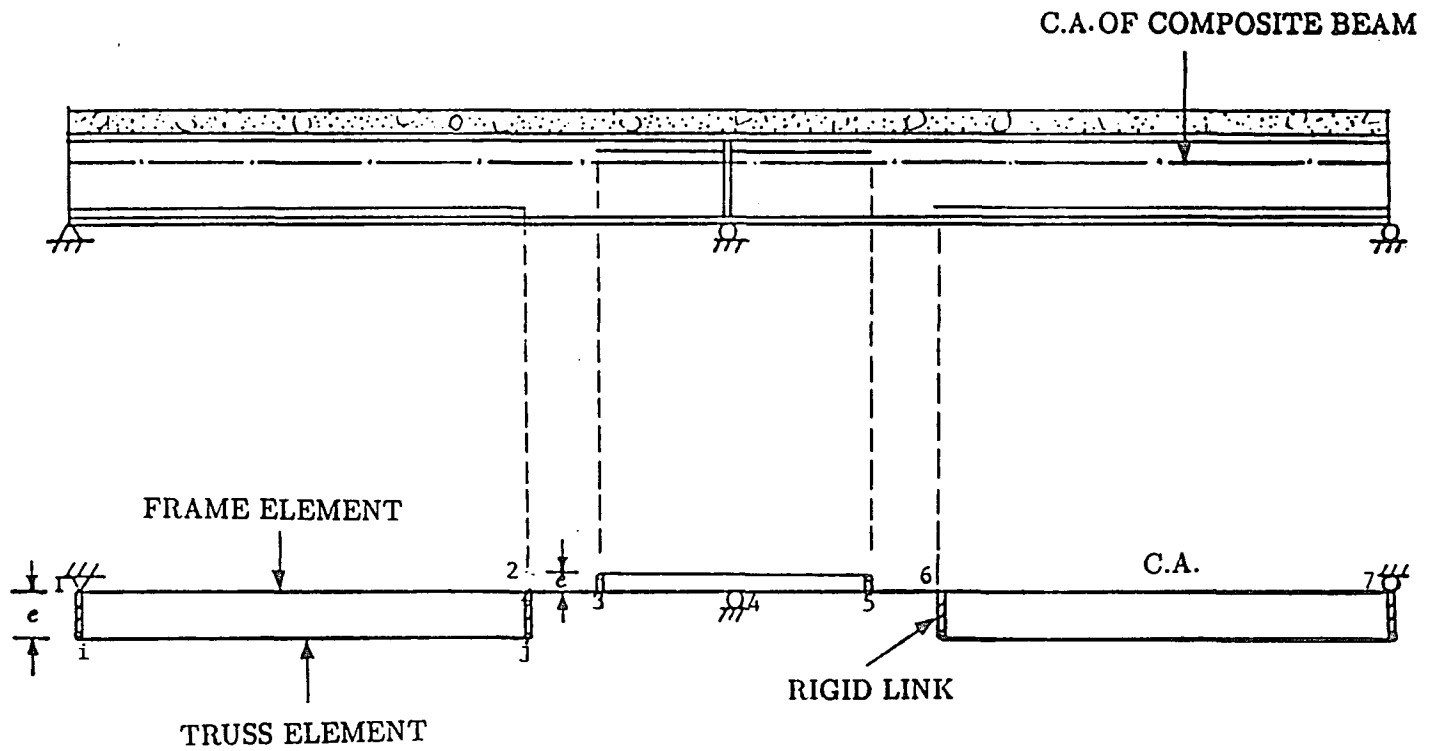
Model of Prestressed Composite Girder with Straight Discontinuous Tendon
